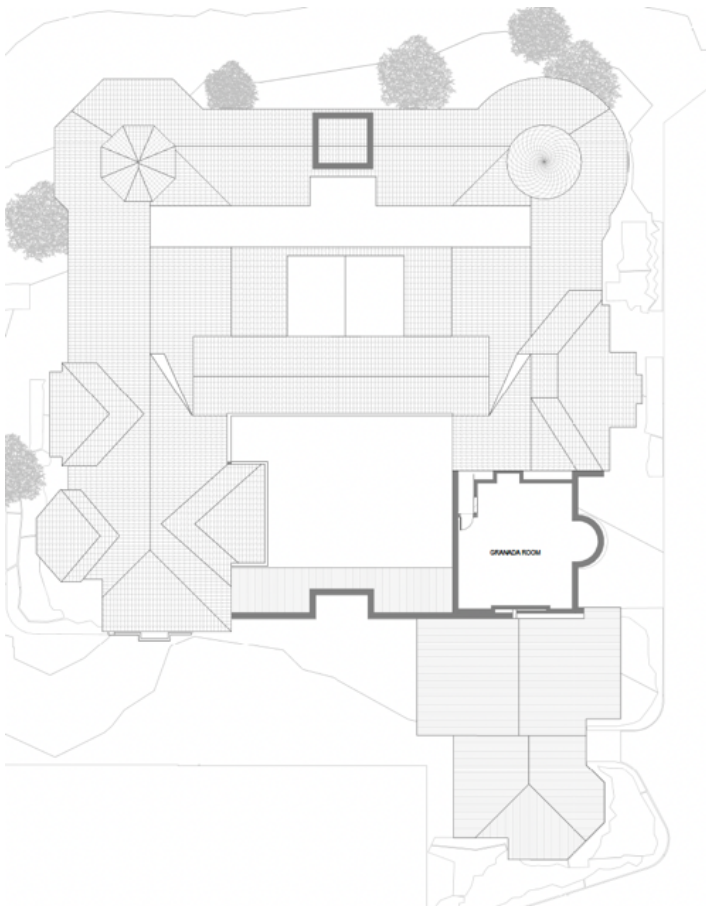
EXISTING FIRST FLOOR PLAN. St John of God Richmond Hospital.
